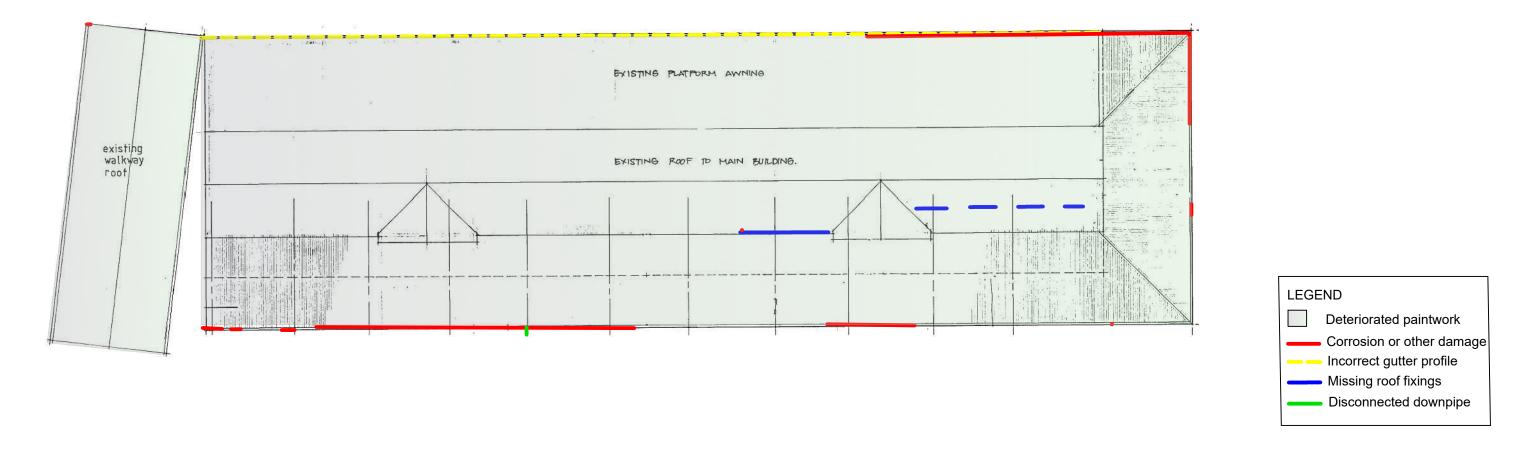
Roof and Gutter Assessment 1922 Station Murwillumbah Railway Station Refurbishment
